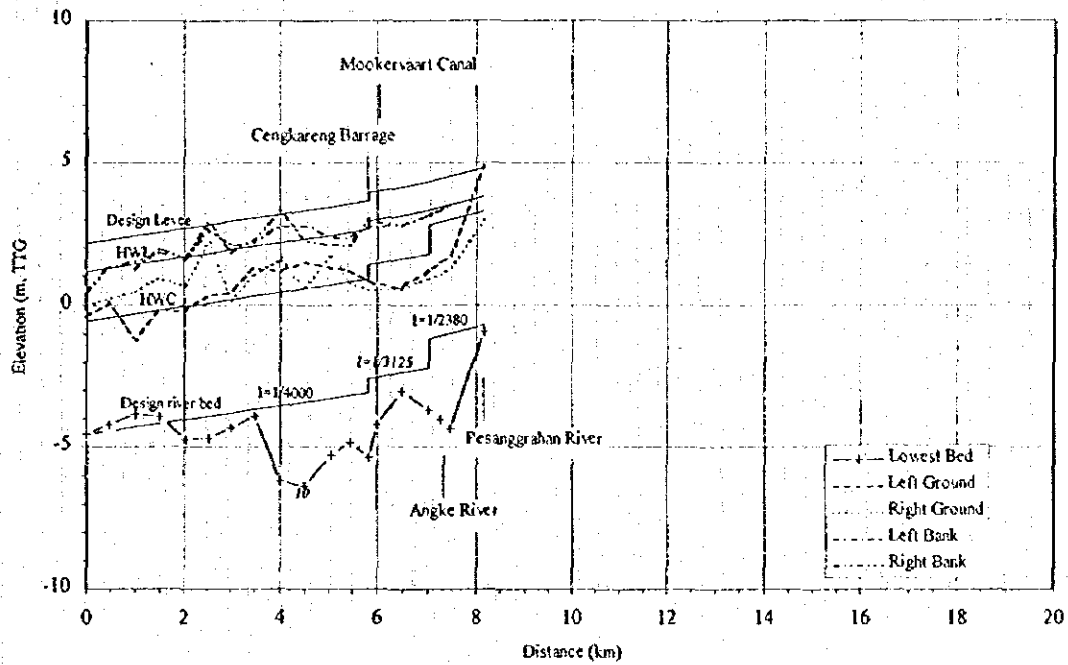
PROPOSED LONGITUDINAL PROFILE AND CROSS SECTION (4/13)
